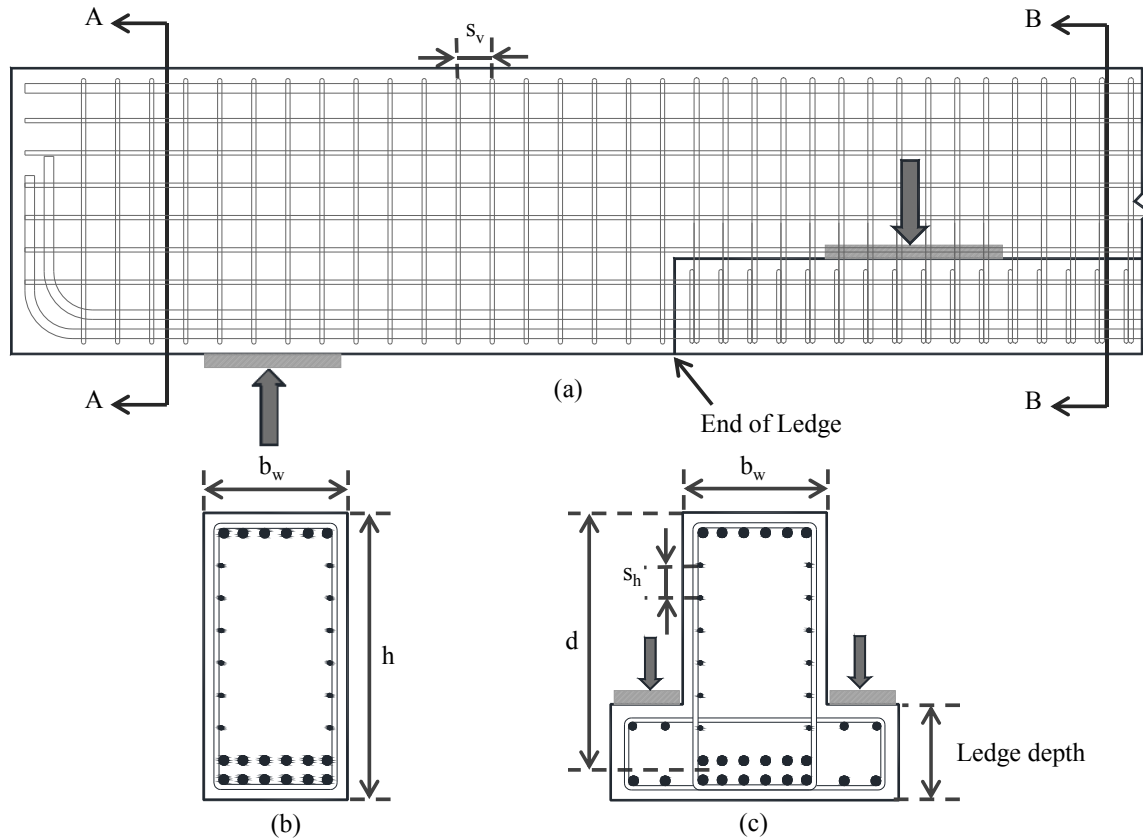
Typical reinforcement detail for specimens; (a) longitudinal, (b) Section A-A, and (c) Section B-B
